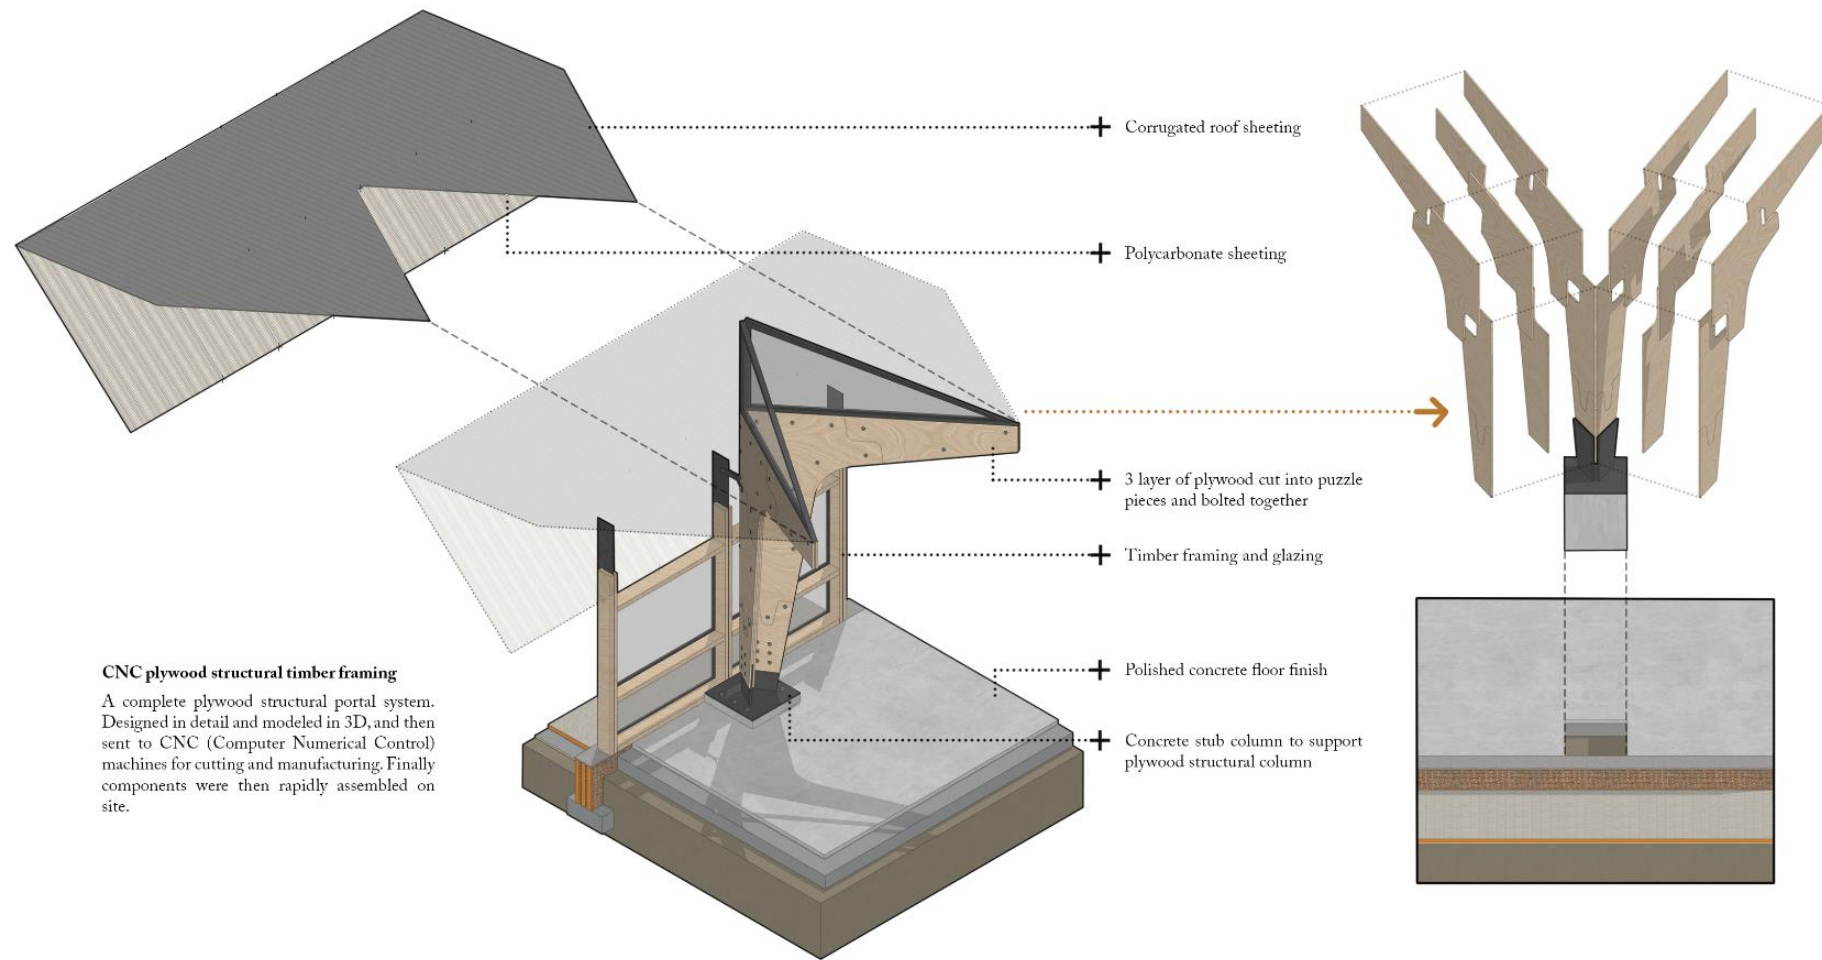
Future Africa Dining Hall (The HUB). Plywood Structural Column. (Source: By Author)
